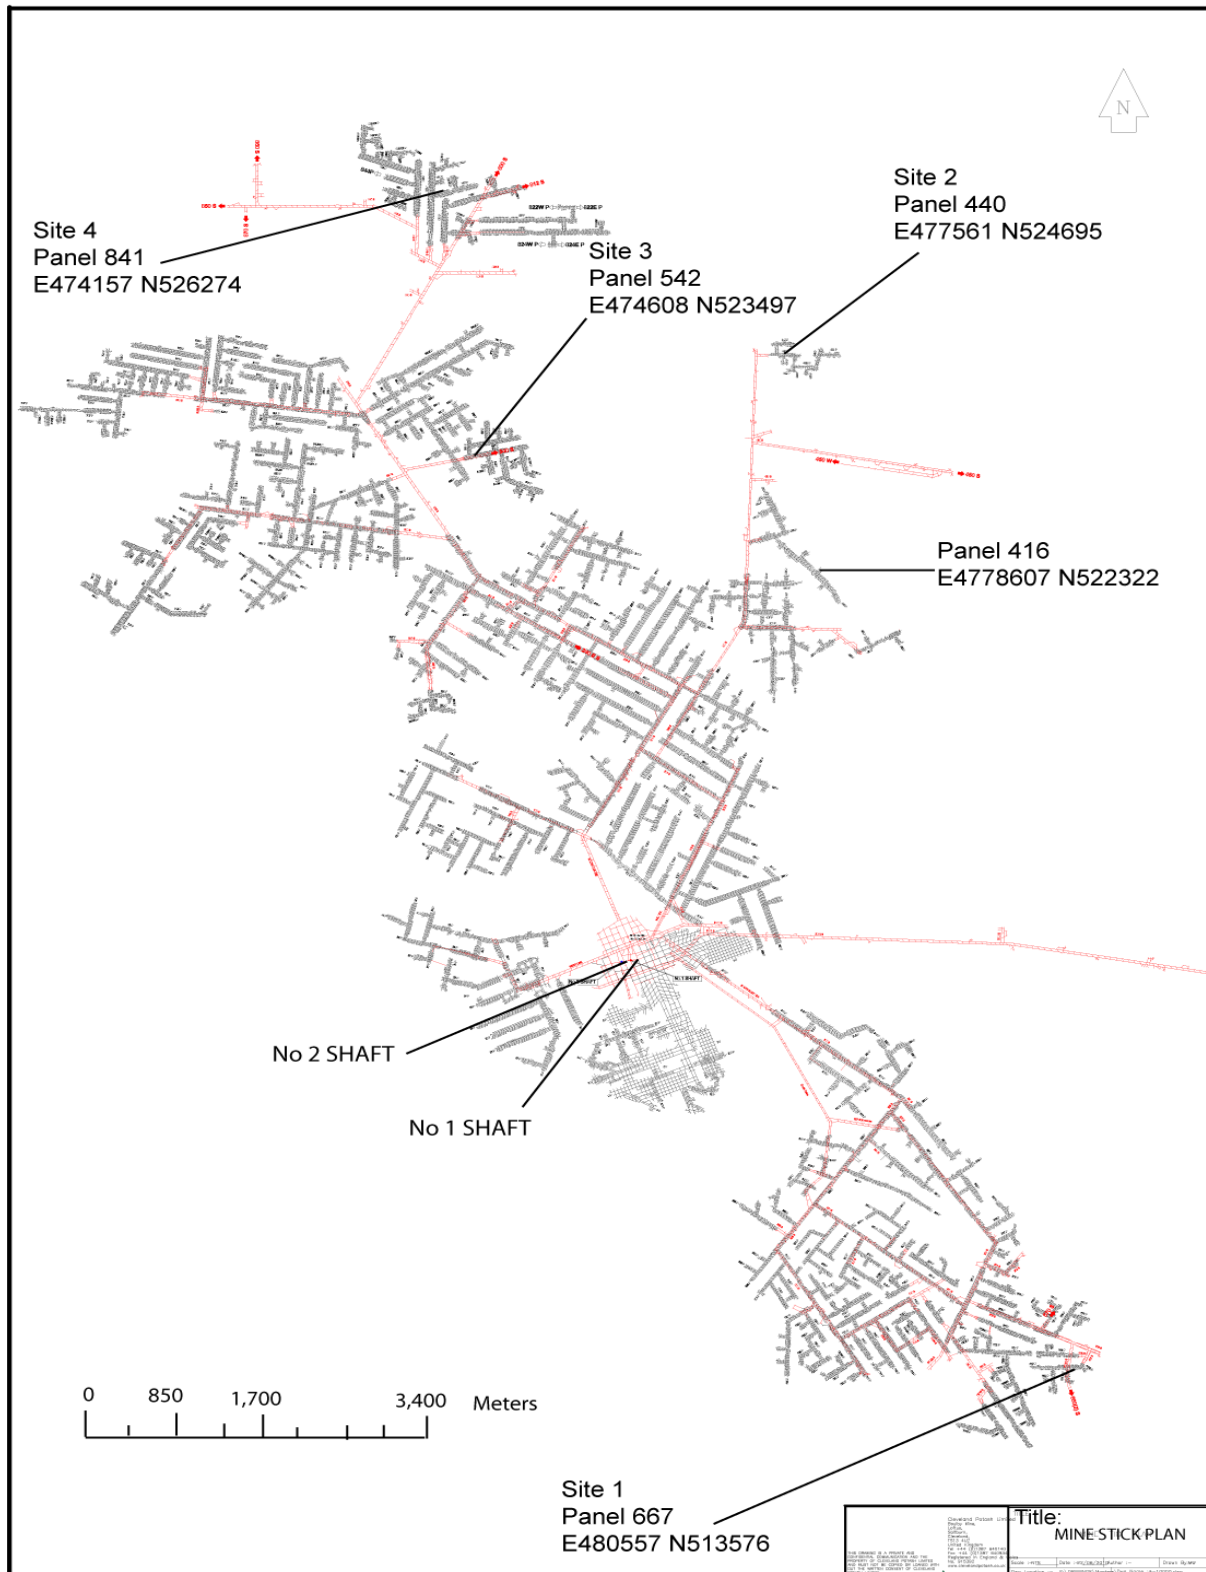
Underground mine layout and instrumented site locations (source: Boulby Mine); where red colour indicates salt roads and black colour indicates potash panels
